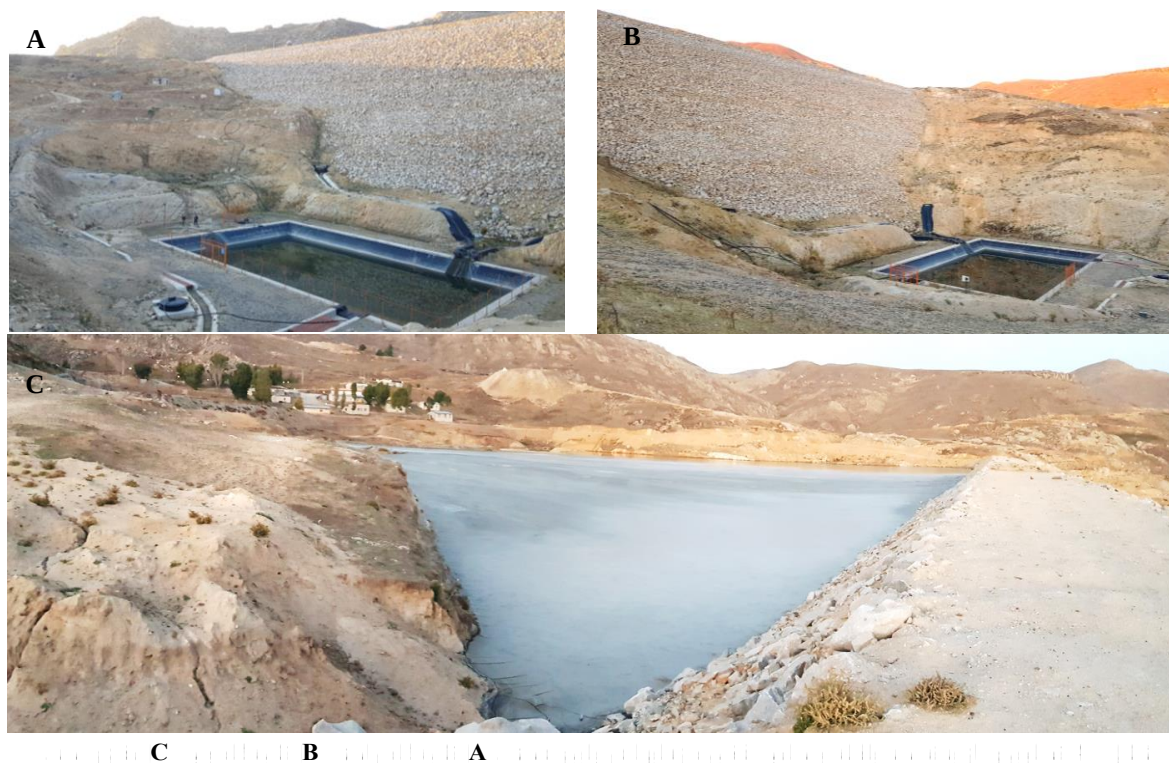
Images from the dam body and drainage sump in downstream A) Right abutment, B) Left abutment C) Dam reservoir.
